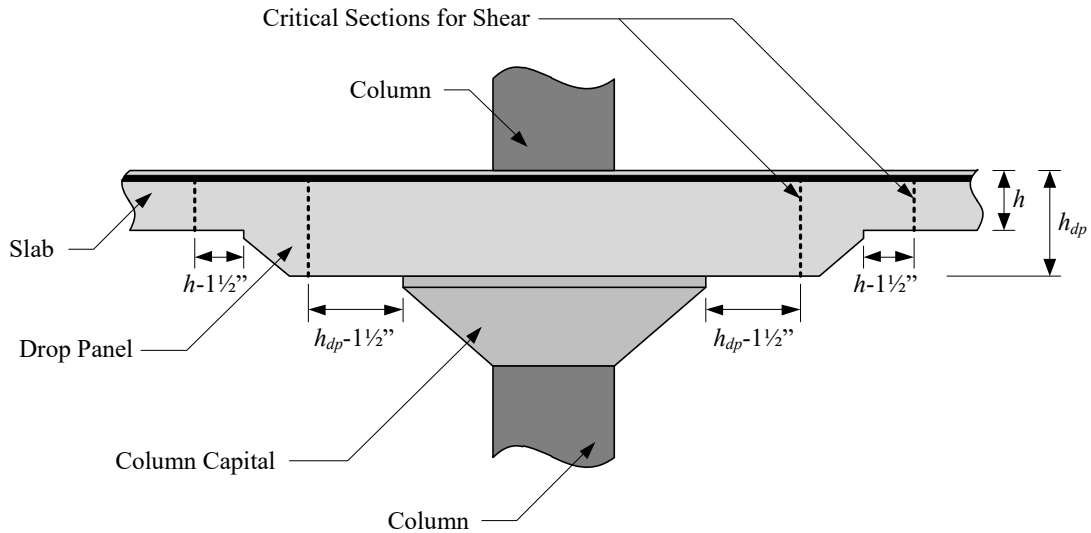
Critical Section Definition (Joint Committee on Standard Specifications for Concrete and Reinforced Concrete, 1921)
